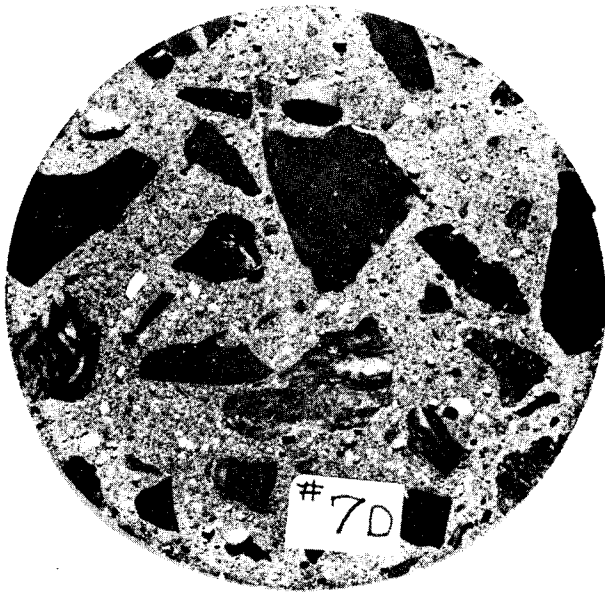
Core from span C of B602 shows large voids caused by poor consolidation of the low slump concrete.
